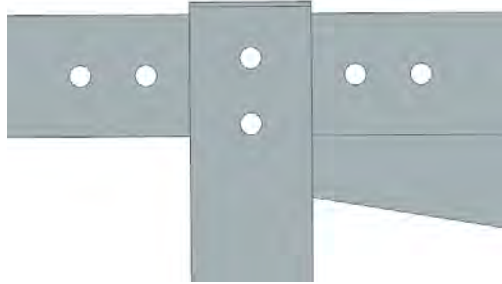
Zoomed in look at the extension of the vertical beam. This connection to the floor directs a compression load to the vertical beam and avoids a risk for high shear loads on adjacent horizontal members
